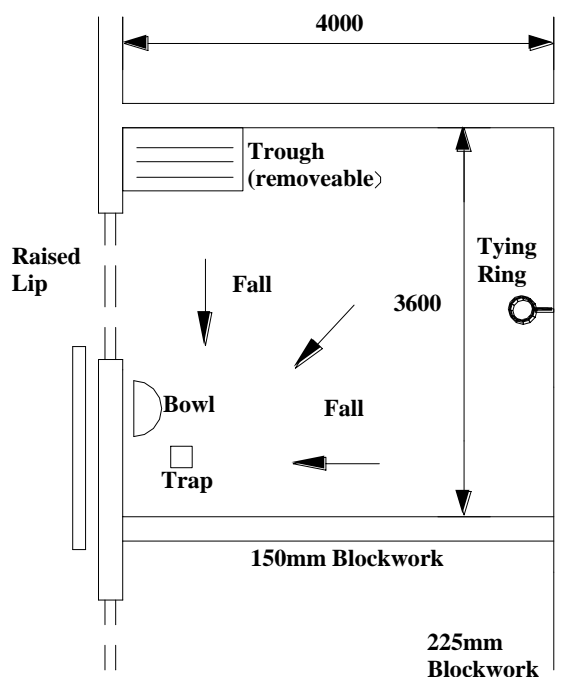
Typical layout of a Separation pen / Isolation box / Calving pen
